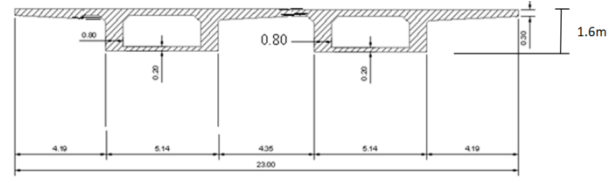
Actual cross section at the end of cantilever-Burri Bridge
